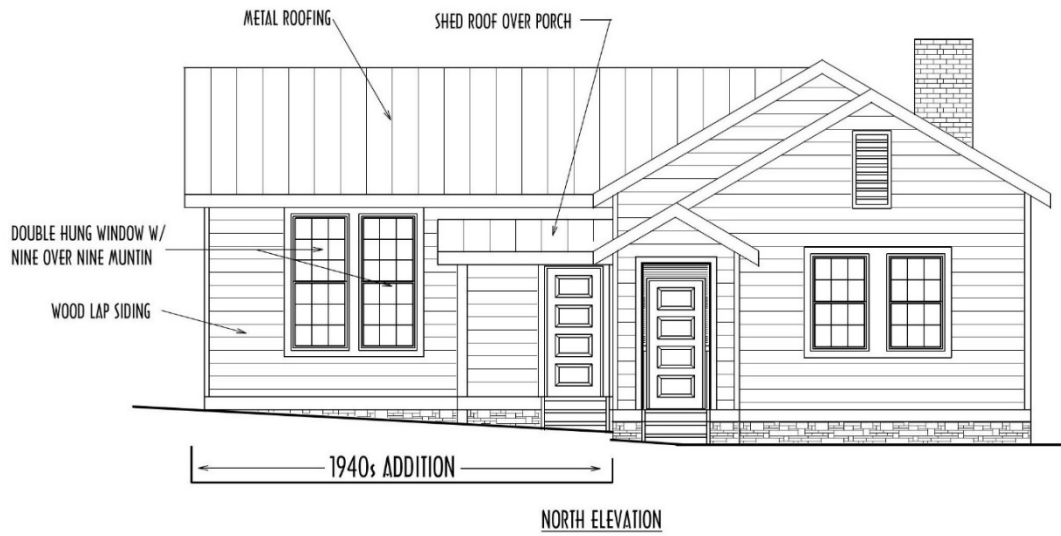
Drawing of the North elevation of Lee-Buckner School with 1940s addition. Drawing by Amanda Floyd.
